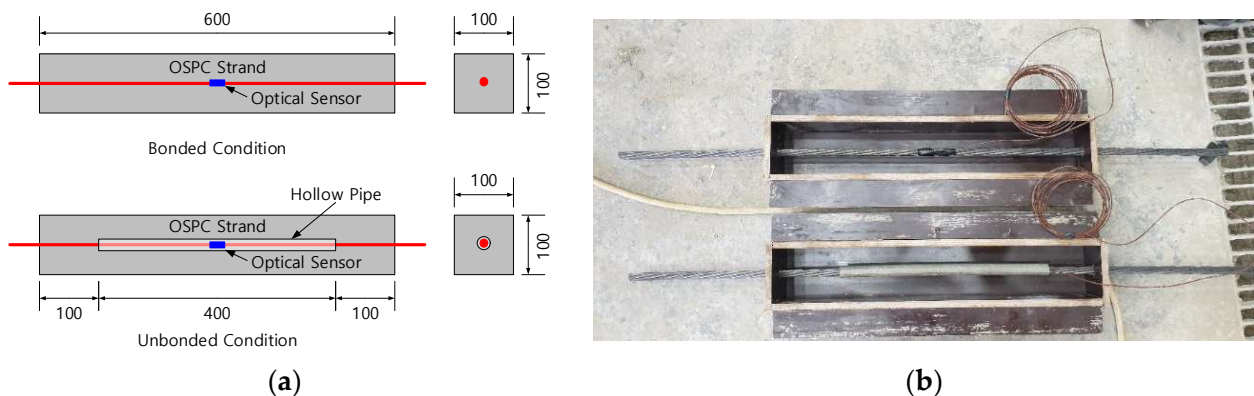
Dimensions of specimens and their production (a) Dimensions and appearance of specimens, (b) Fabrication of specimens.
